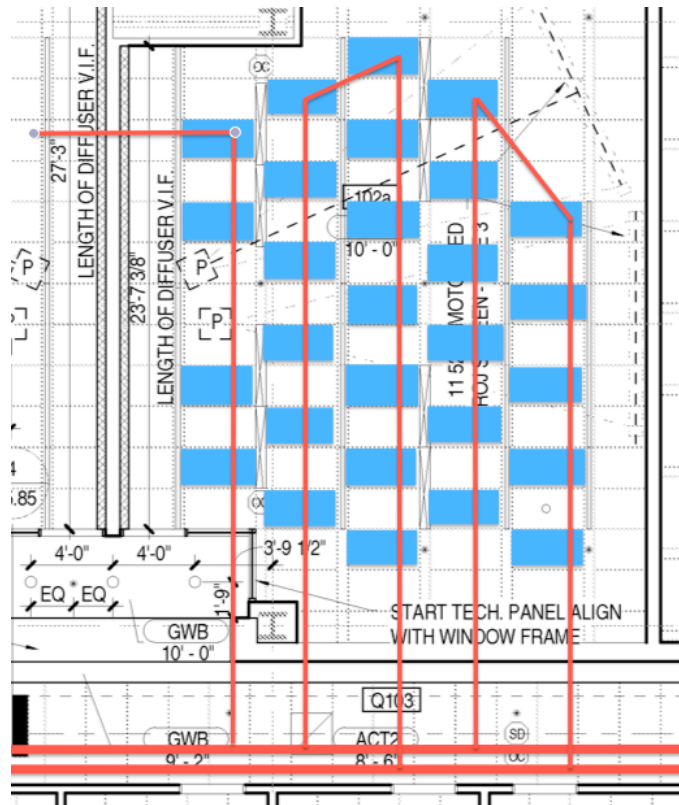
Typical Classroom Radiant Panel Layout
